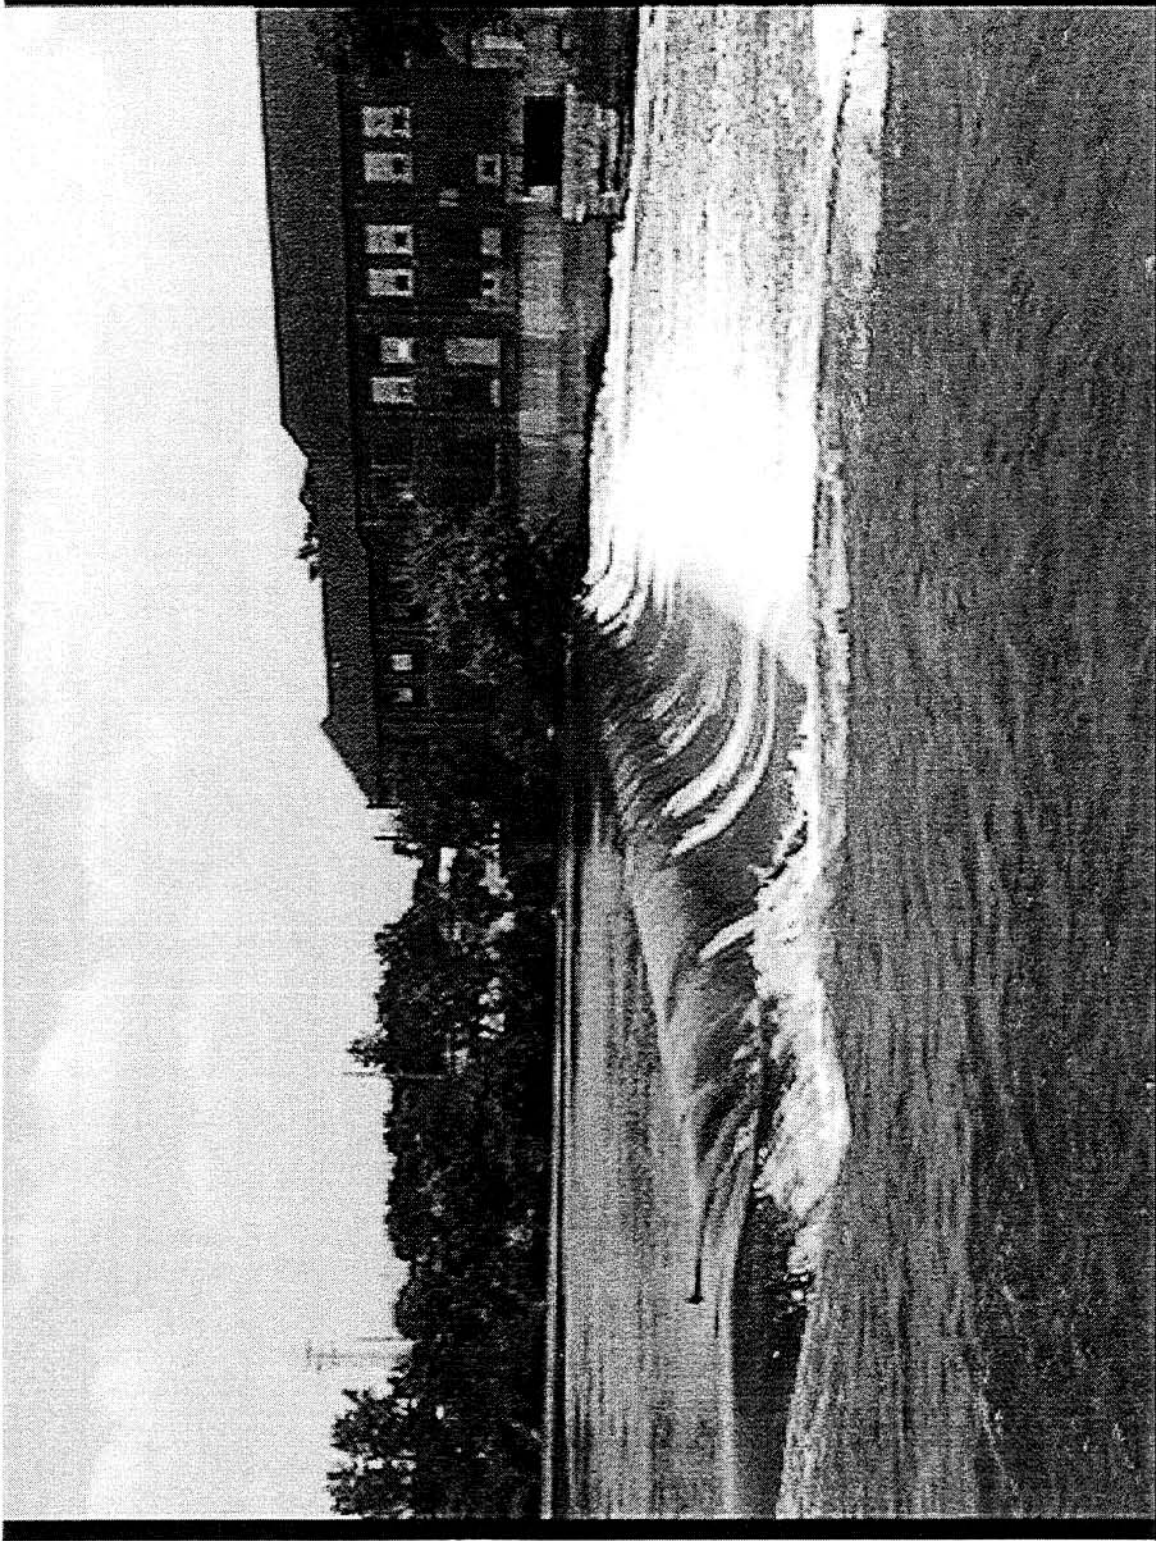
Existing Batavia Dam spillway (6/28/97)
